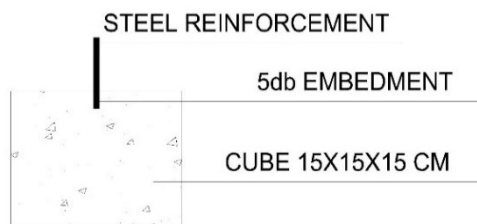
Illustration of the Embedded Steel Reinforcement in the Concrete Cube Specimen
